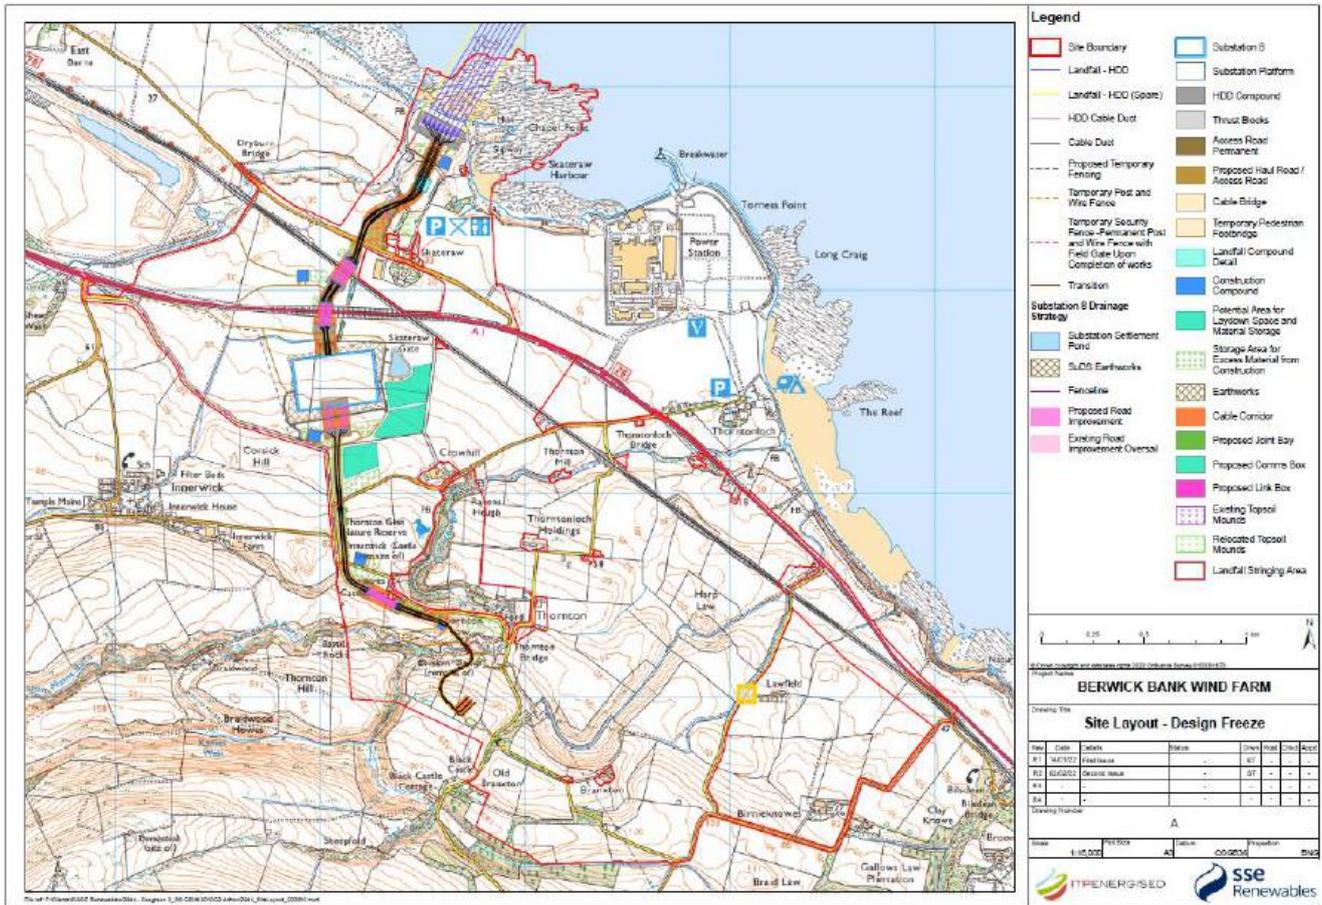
Substation Locations and Landfall Locations (courtesy of ITPowered and SSE Renewables)
